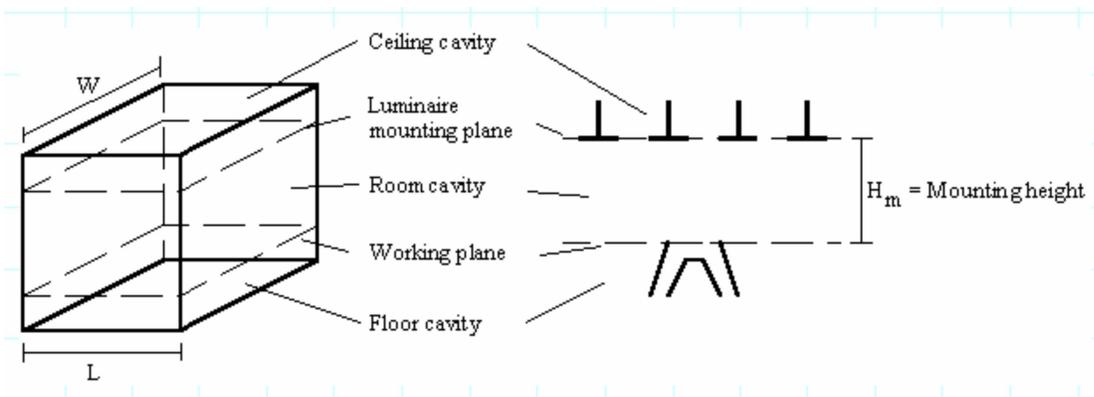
Typical Room Dimensions [Mitroy, 2009]
